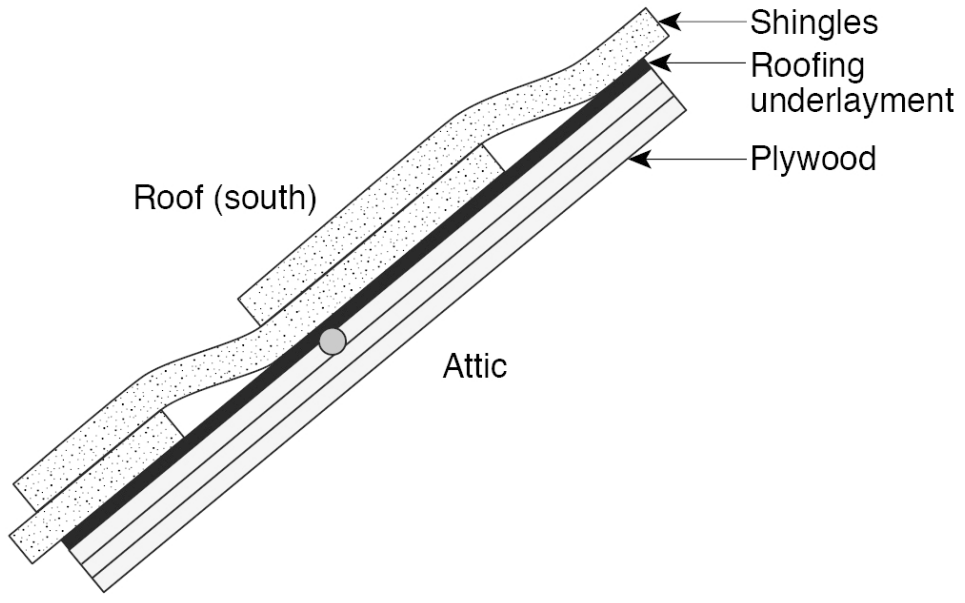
Layered roof structure for the CCHT house. The dot refers to the sensor location.
